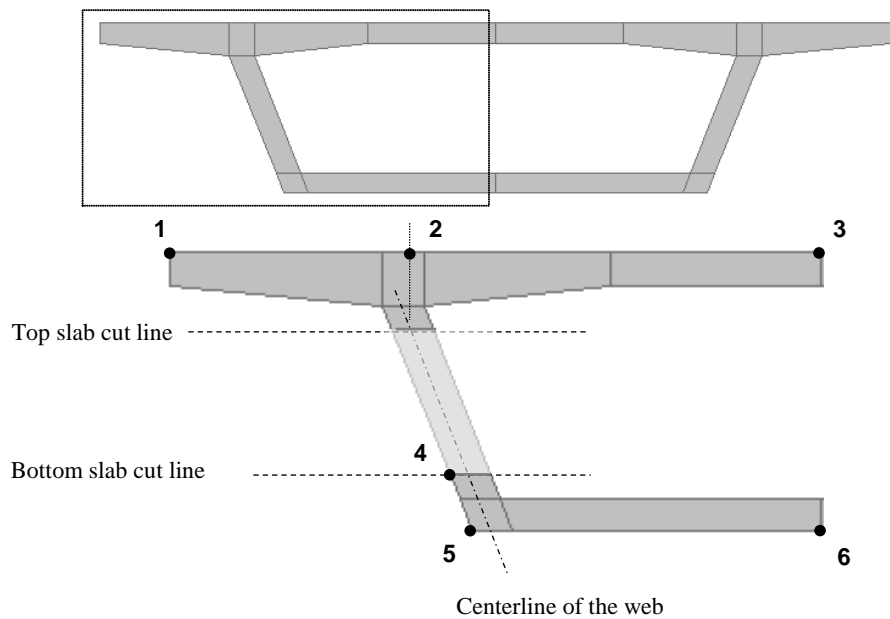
Bridge Concrete Box Deck Section - AASHTO - PCI - ASBI Standard
